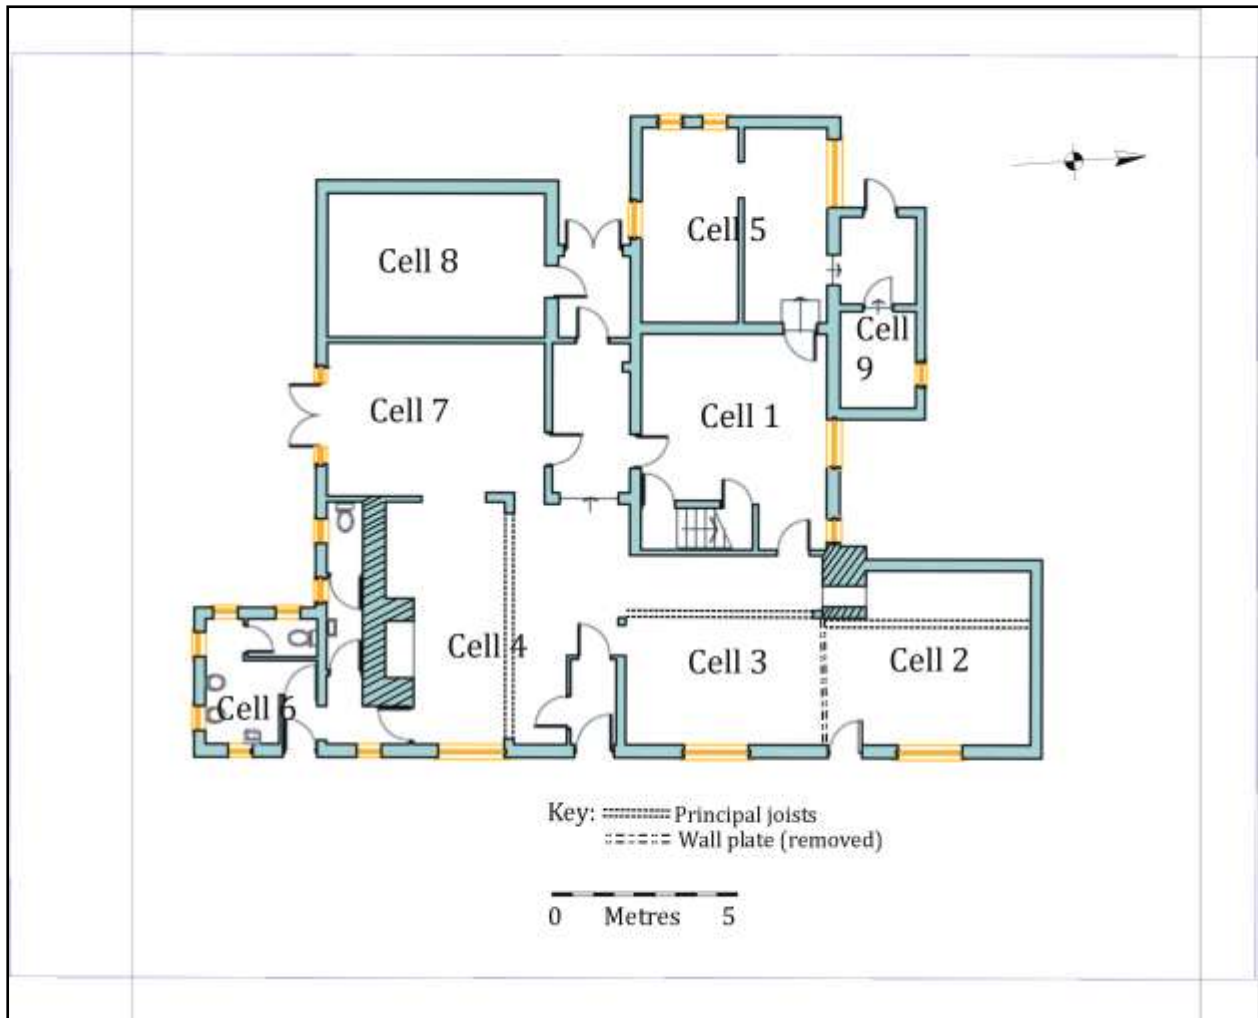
Existing ground floor plan showing ceiling beam locations, and where removed (walls)
